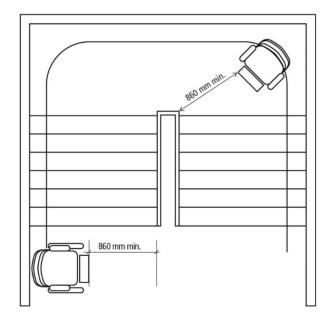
(2)(j) Stair in a dwelling unit of a residential occupancy Clear width".
